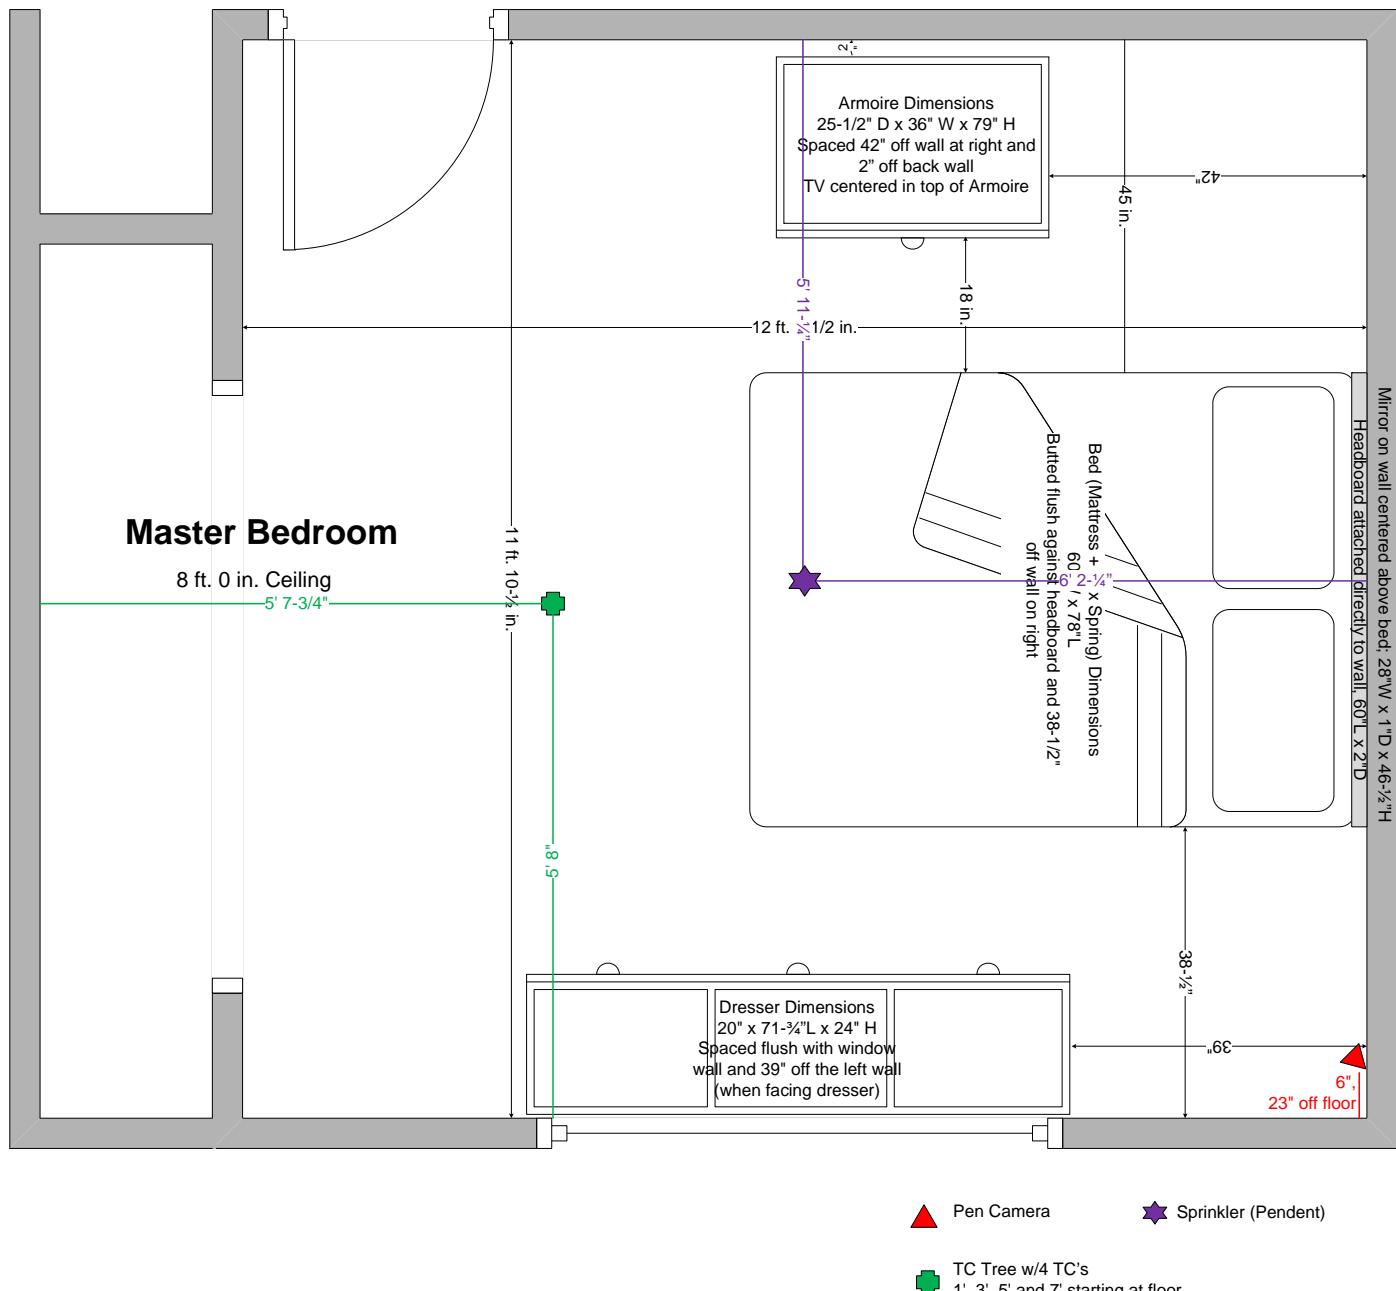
One-Story Master Bedroom (Bedroom 1) Detail
